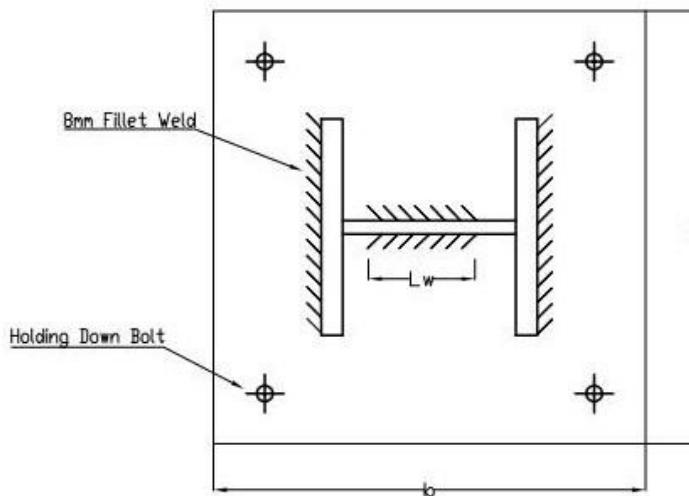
Figure showing the cross-section of the column base joints considered in this project.
